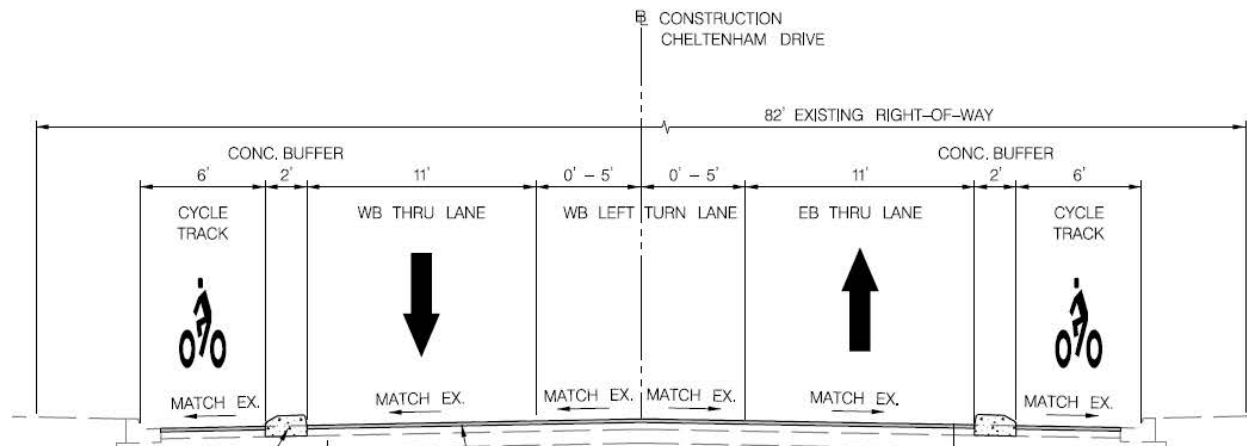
Typical Section – Cheltenham Drive Between Wisconsin Avenue and Entrance to Roundabout
